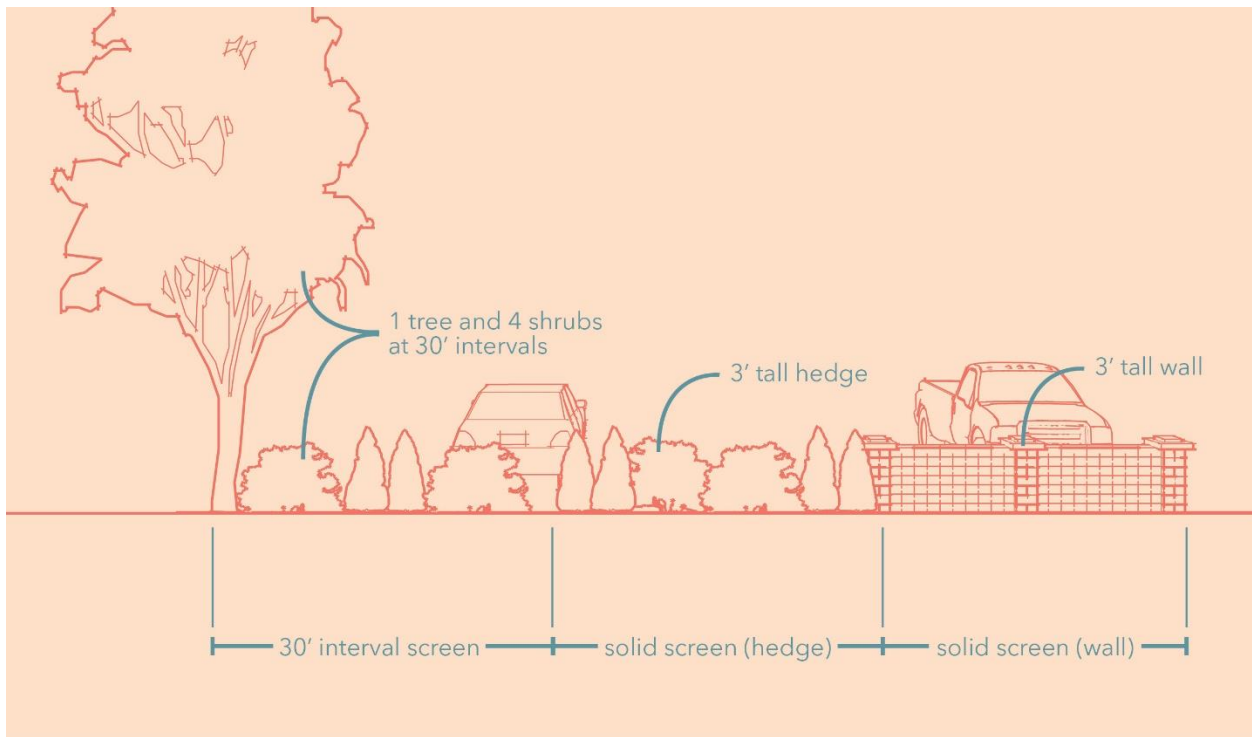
PARKING LOT FRONTAGE LANDSCAPING
